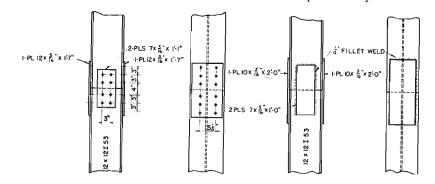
Steel-pile splices using bolted or welded splice plates.
